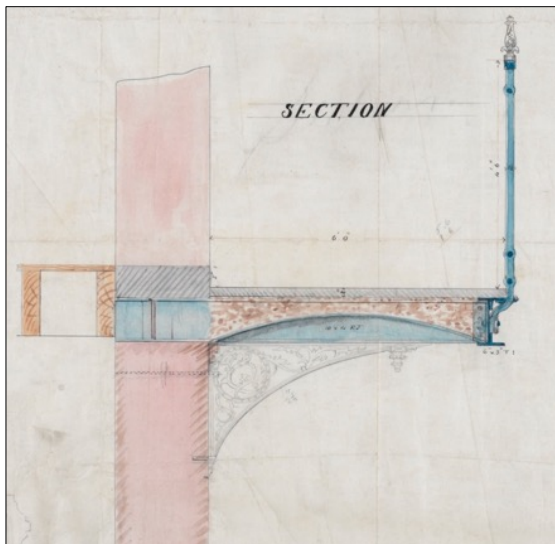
(left) 1890 balcony detail prepared by the office of architect William Pitt.
